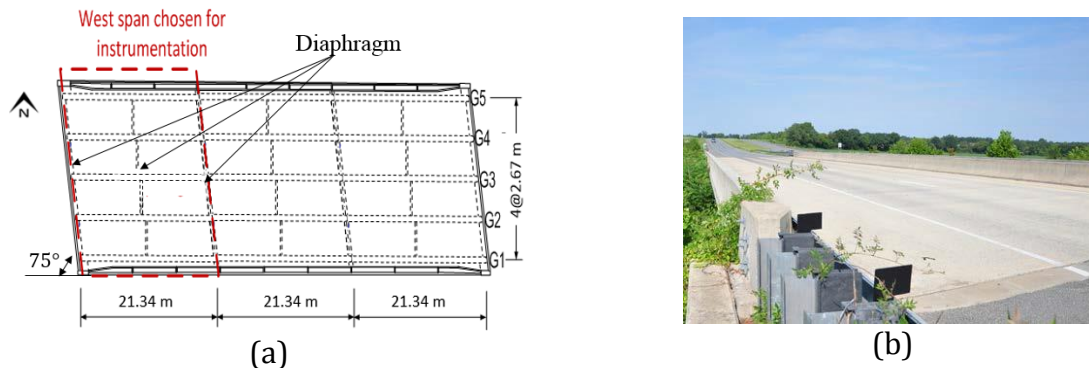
SR113 bridge over Dry Creek: (a) Plan view; (b) Bridge photo.
